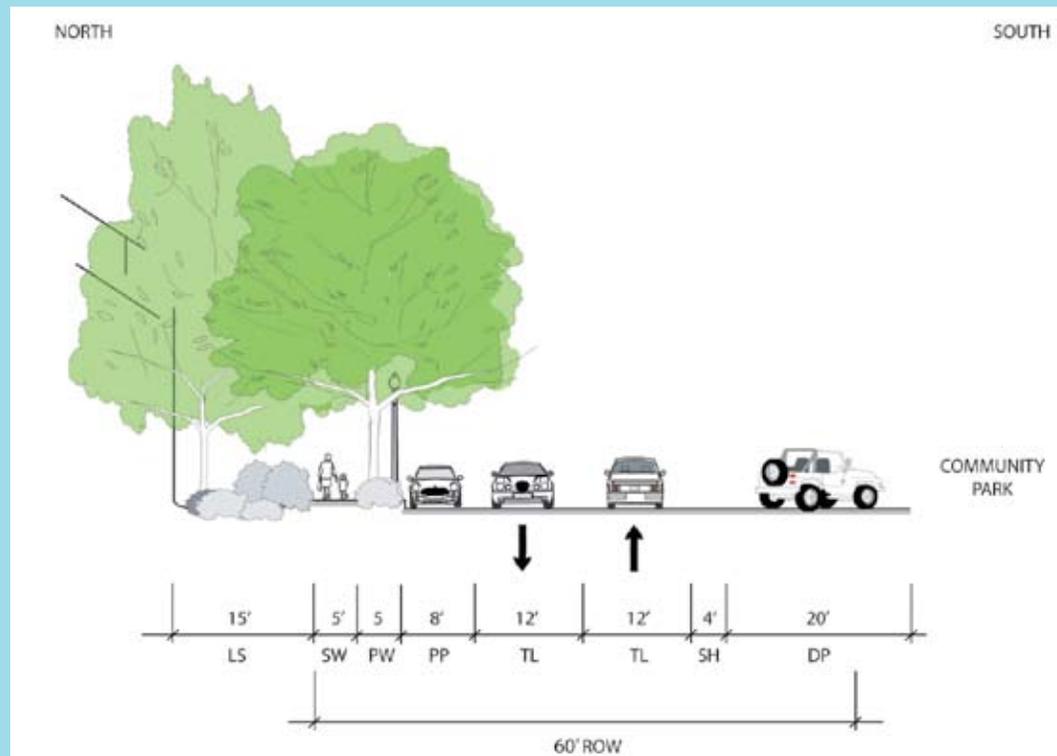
RIVER STREET FROM C STREET TO D STREET
